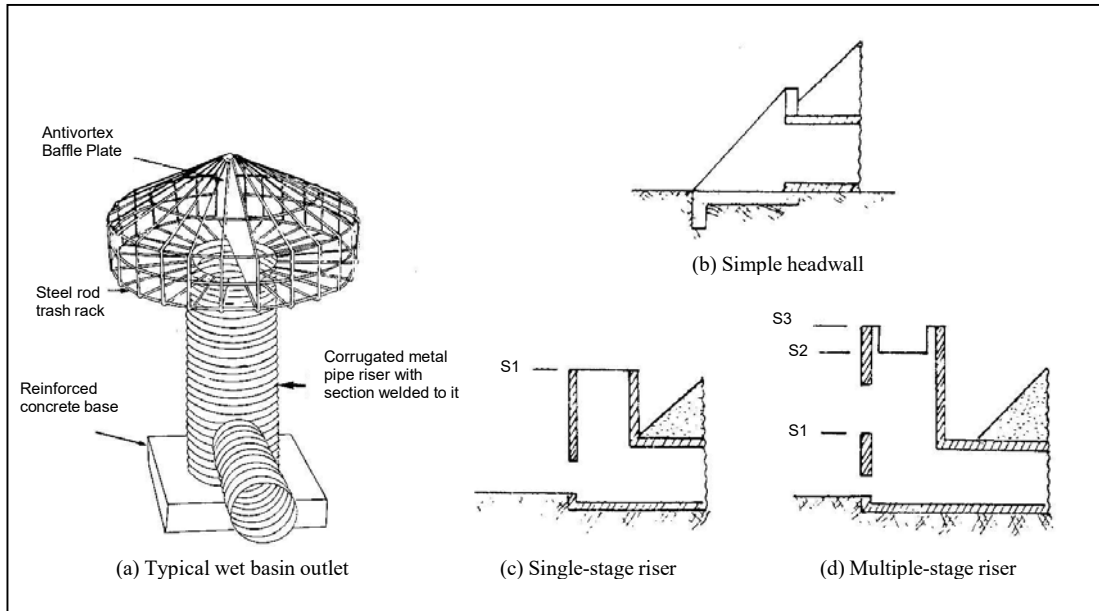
Typical inlet arrangements for pond outlet structures. (a) shows a typical single outlet riser pipe for a retention basin. (b) (c) and (d) show several arrangements for detention basin outlet structures with S1, S2 and S3 marking the various outlet stages. From American Society of Civil Engineers, *Manuals and Reports of Engineering Practice No. 77* “Design and Construction of Urban Stormwater Management Systems”, p. 270, 1992.
